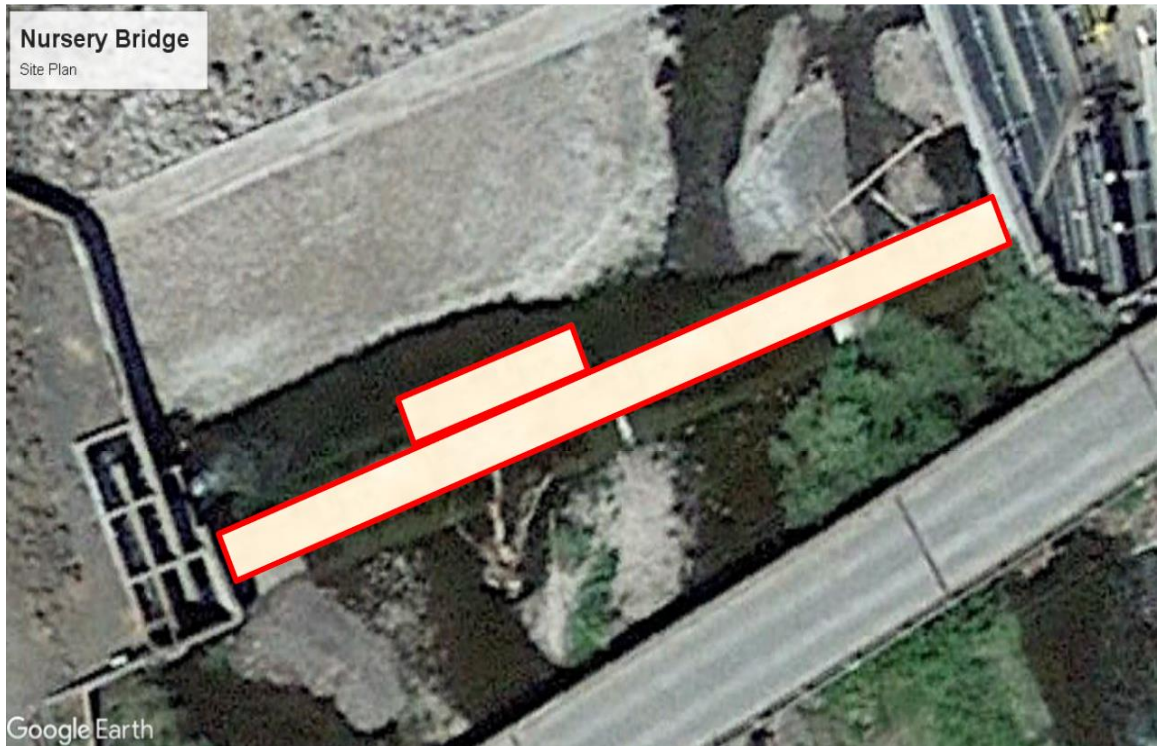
Approximate location of steel plate installation at the Nursery Bridge Drop Structure in 2022. The location of the steel plates is outlined in red.
